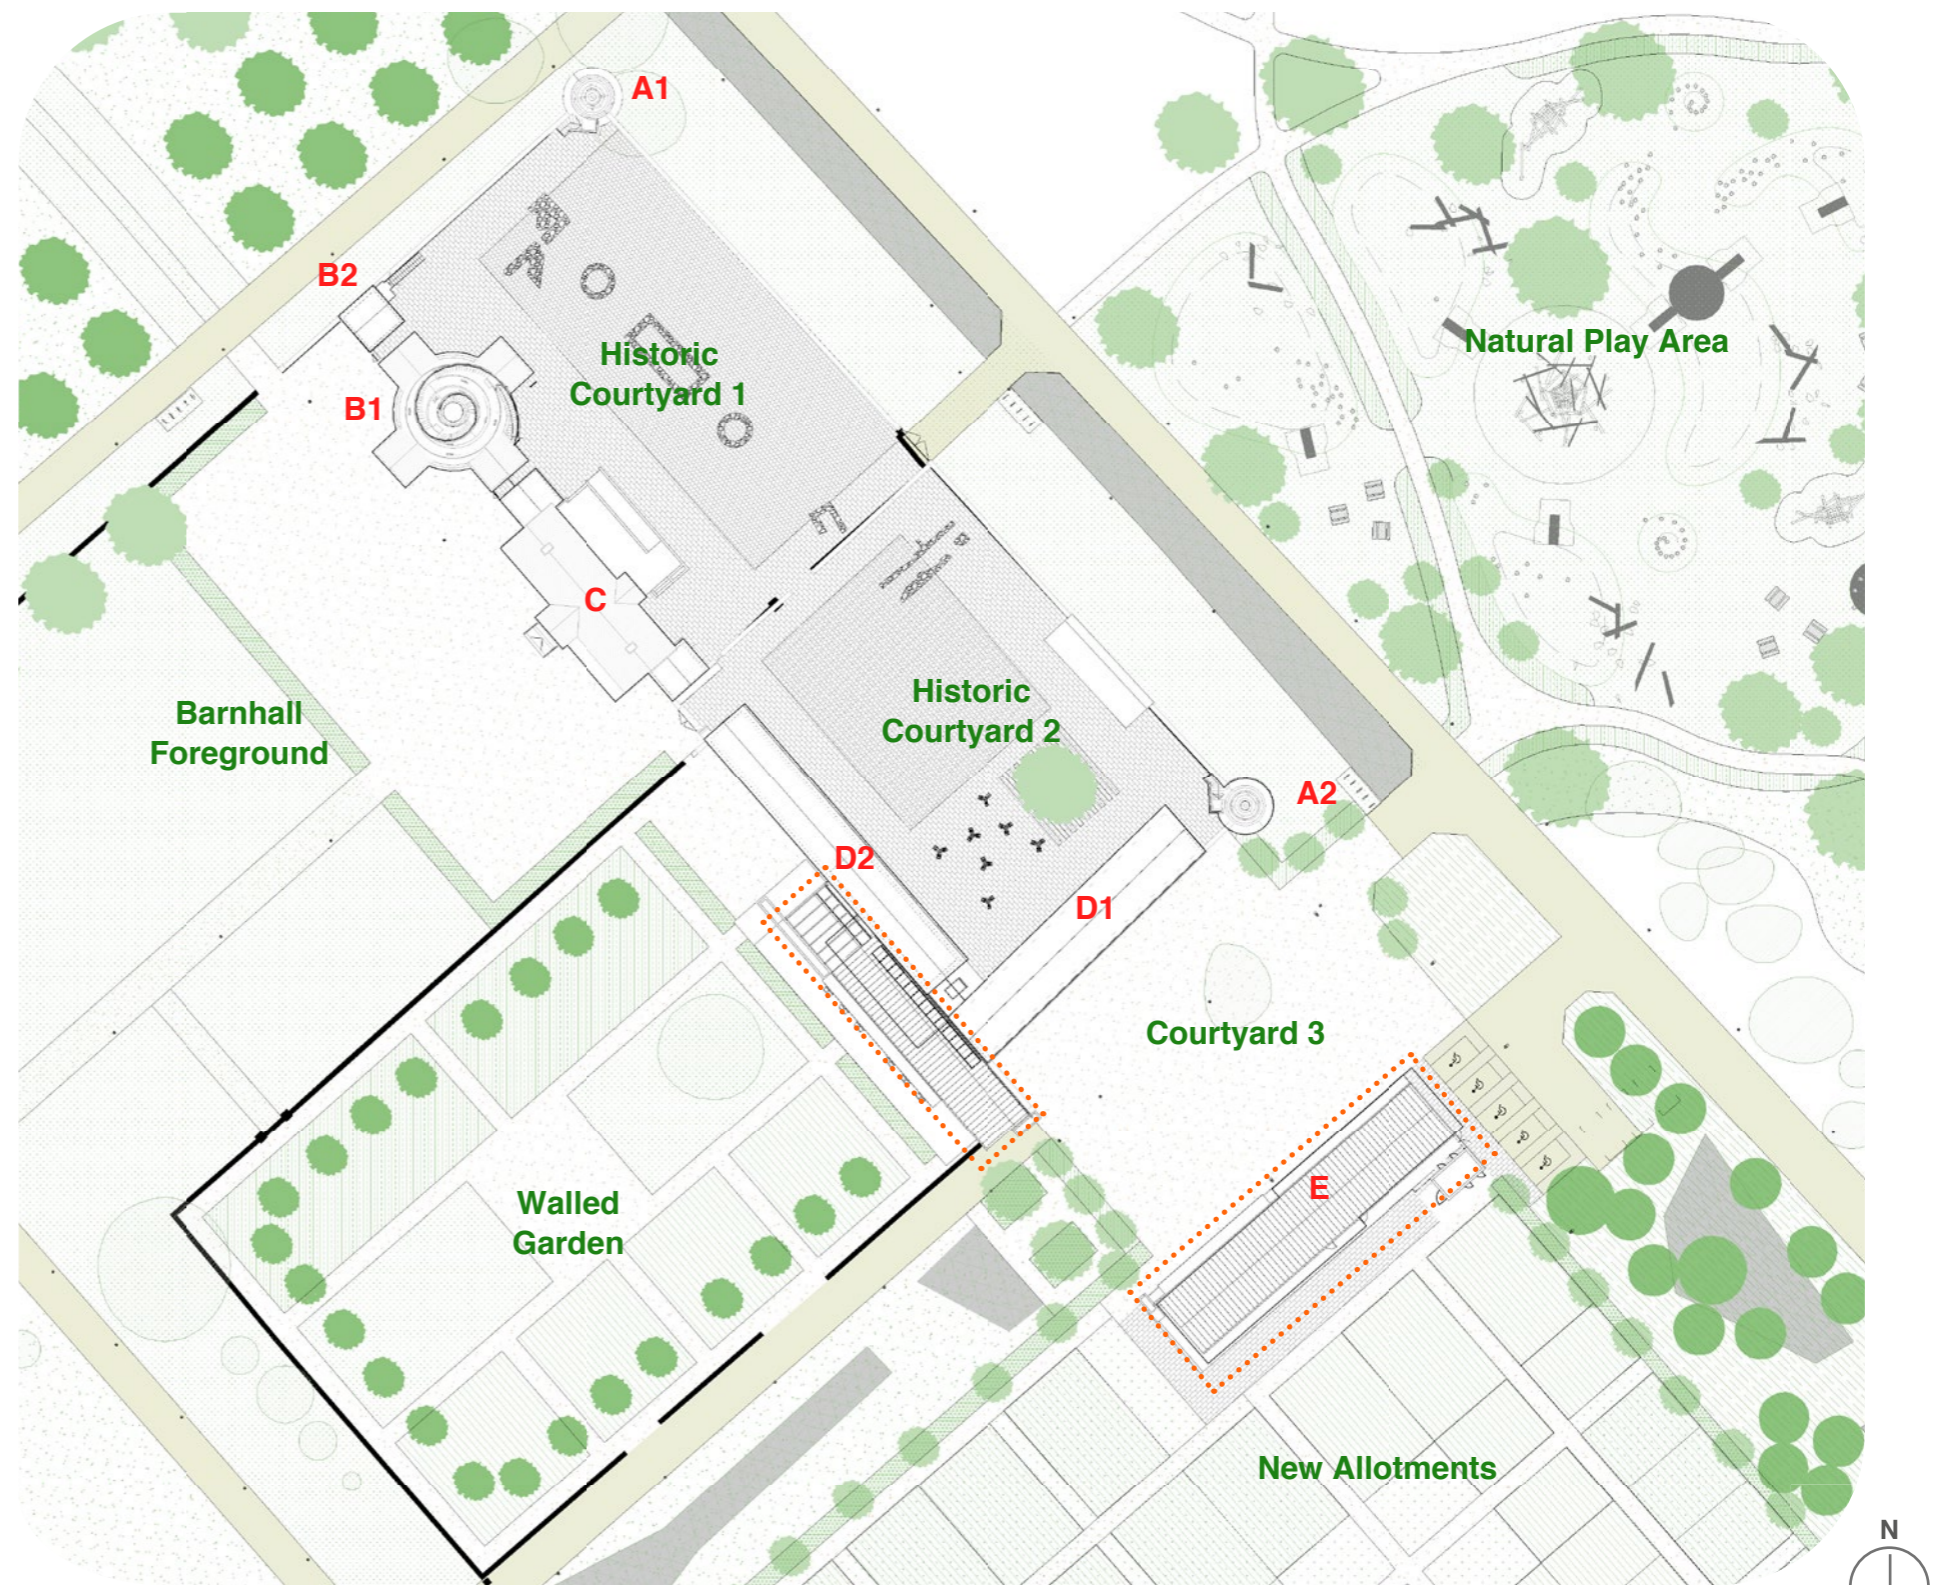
; Site Plan of Proposed Works at and around the Wonderful Barn. Block names in Red, Public Spaces in Green. New Structures with Orange Outline
